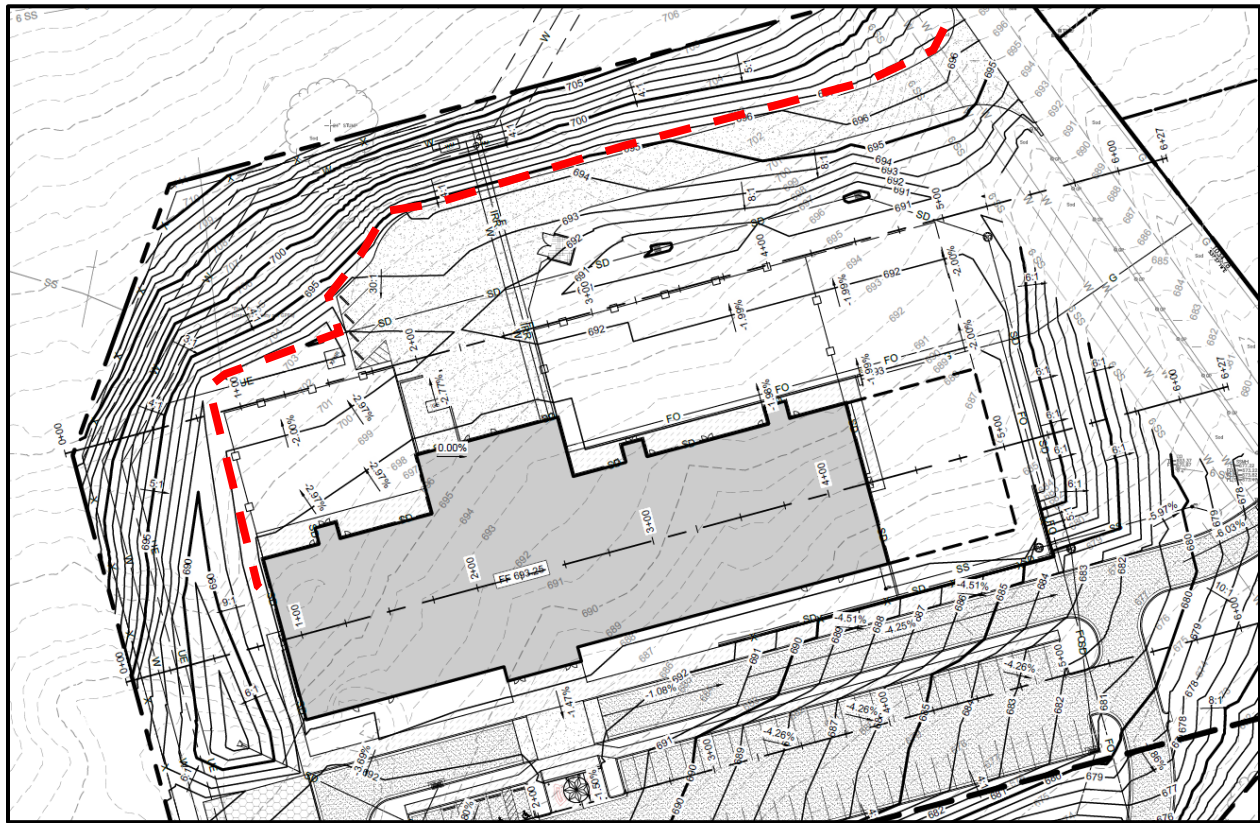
Approximate alignment of recommended open draining ditch/French drain
